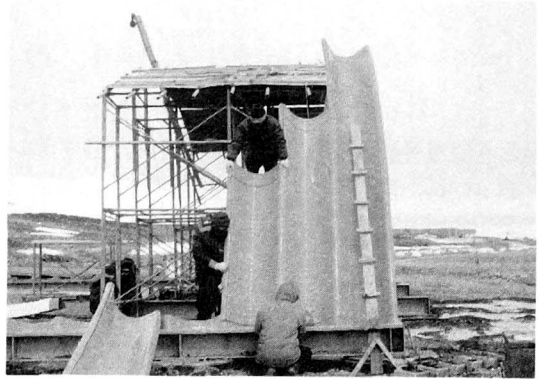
Panels which are installed on the roof of the new building at King Sejong Station.
